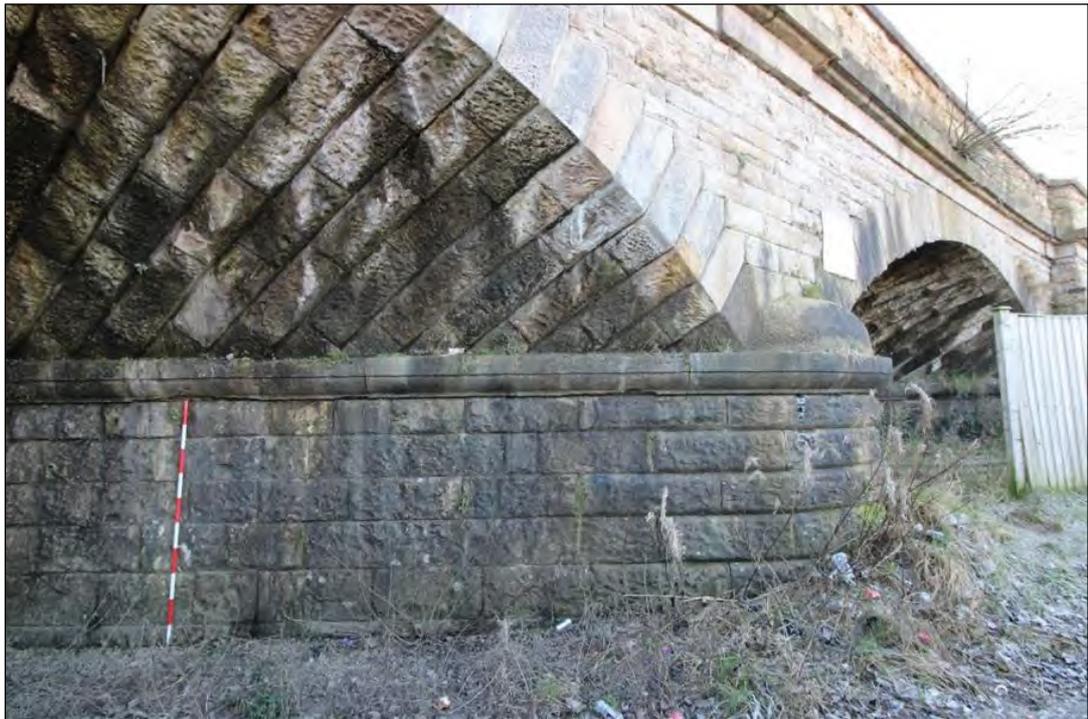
Northern elevation, span 2, showing rusticated masonry, 2m scale
